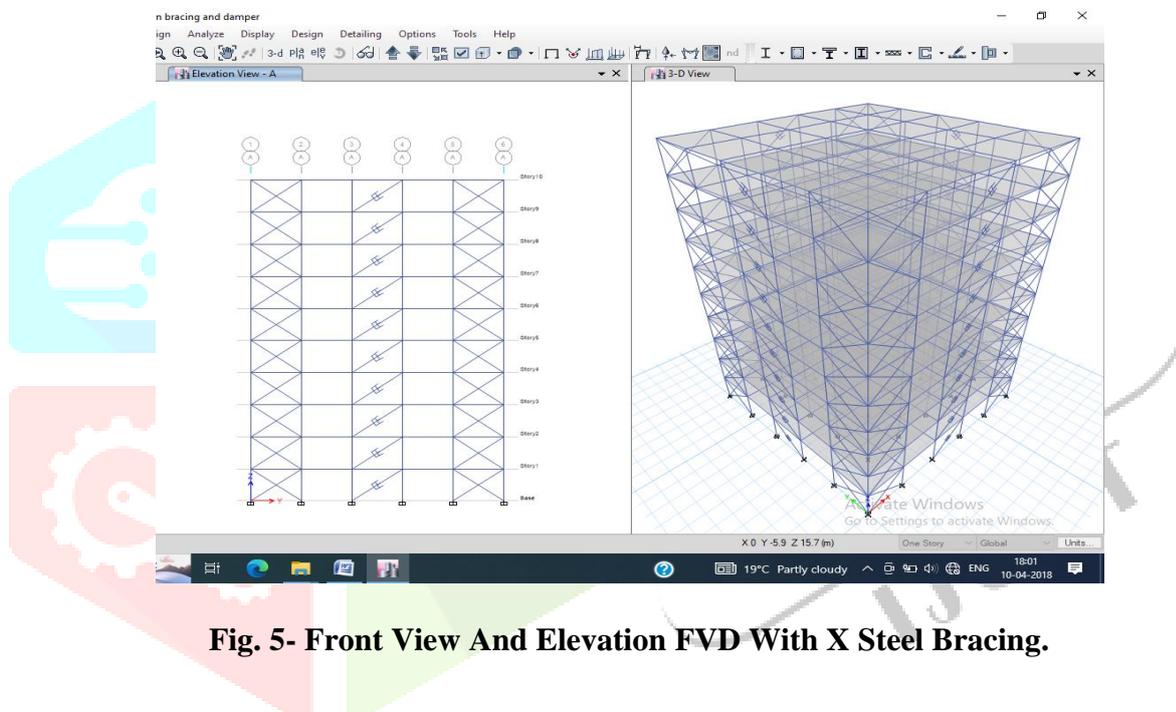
Front View And Elevation FVD With X Steel Bracing.
